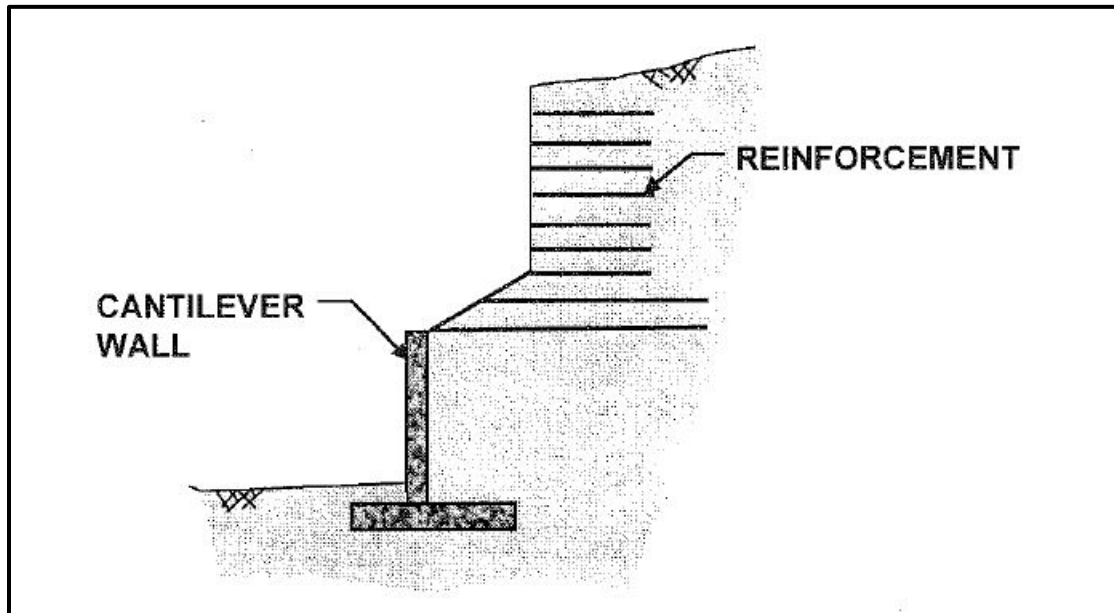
, Hybrid Wall – Cantilever Concrete under MSE Wall
